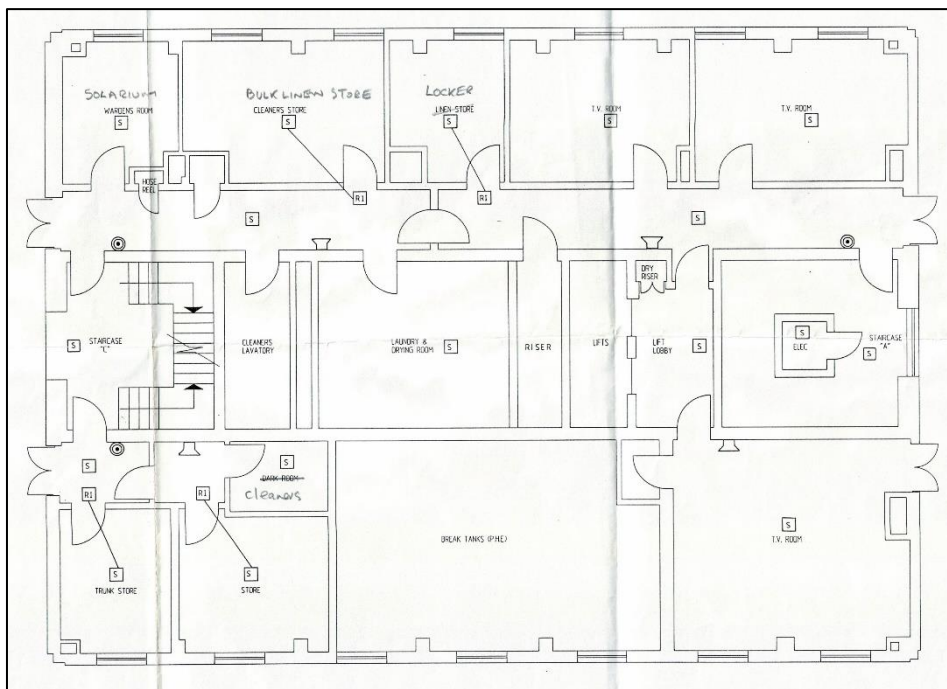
The 1994 fire alarm layout and plan of the fourth floor, section house tower, not to scale (J.E. Greatorex and Partners)
